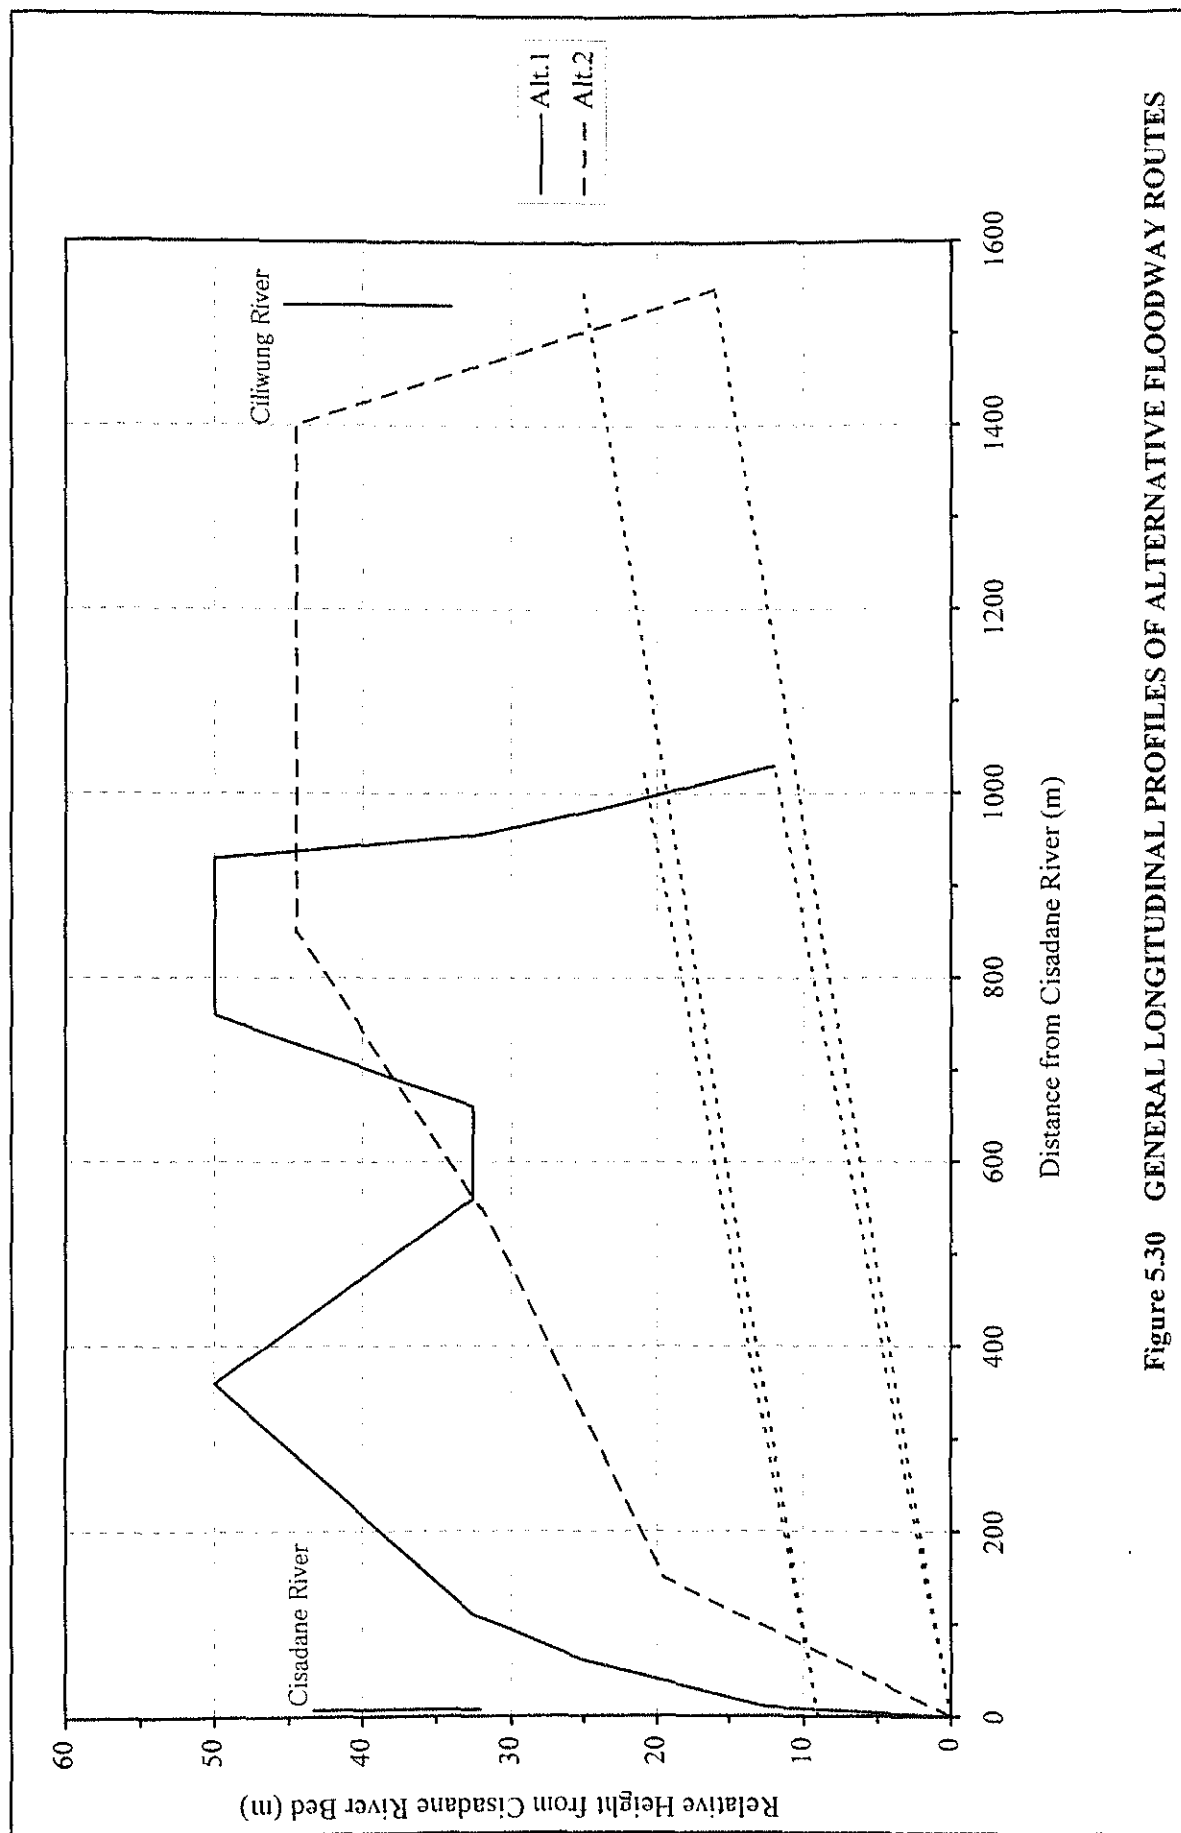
GENERAL LONGITUDINAL PROFILES OF ALTERNATIVE FLOODWAY ROUTES
